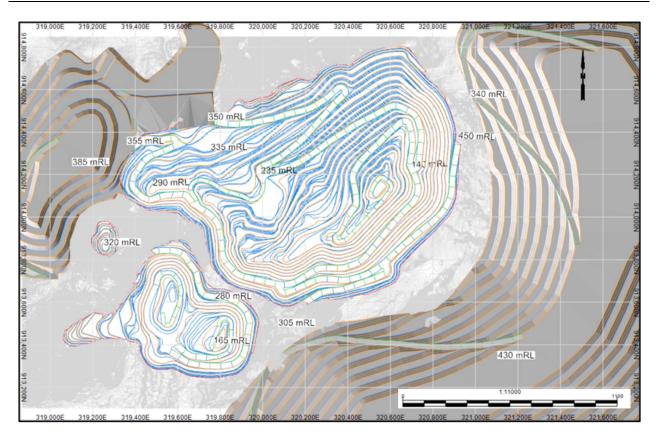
Ultimate Lafigué Pit Design (Plan View) (SRK,2022)
